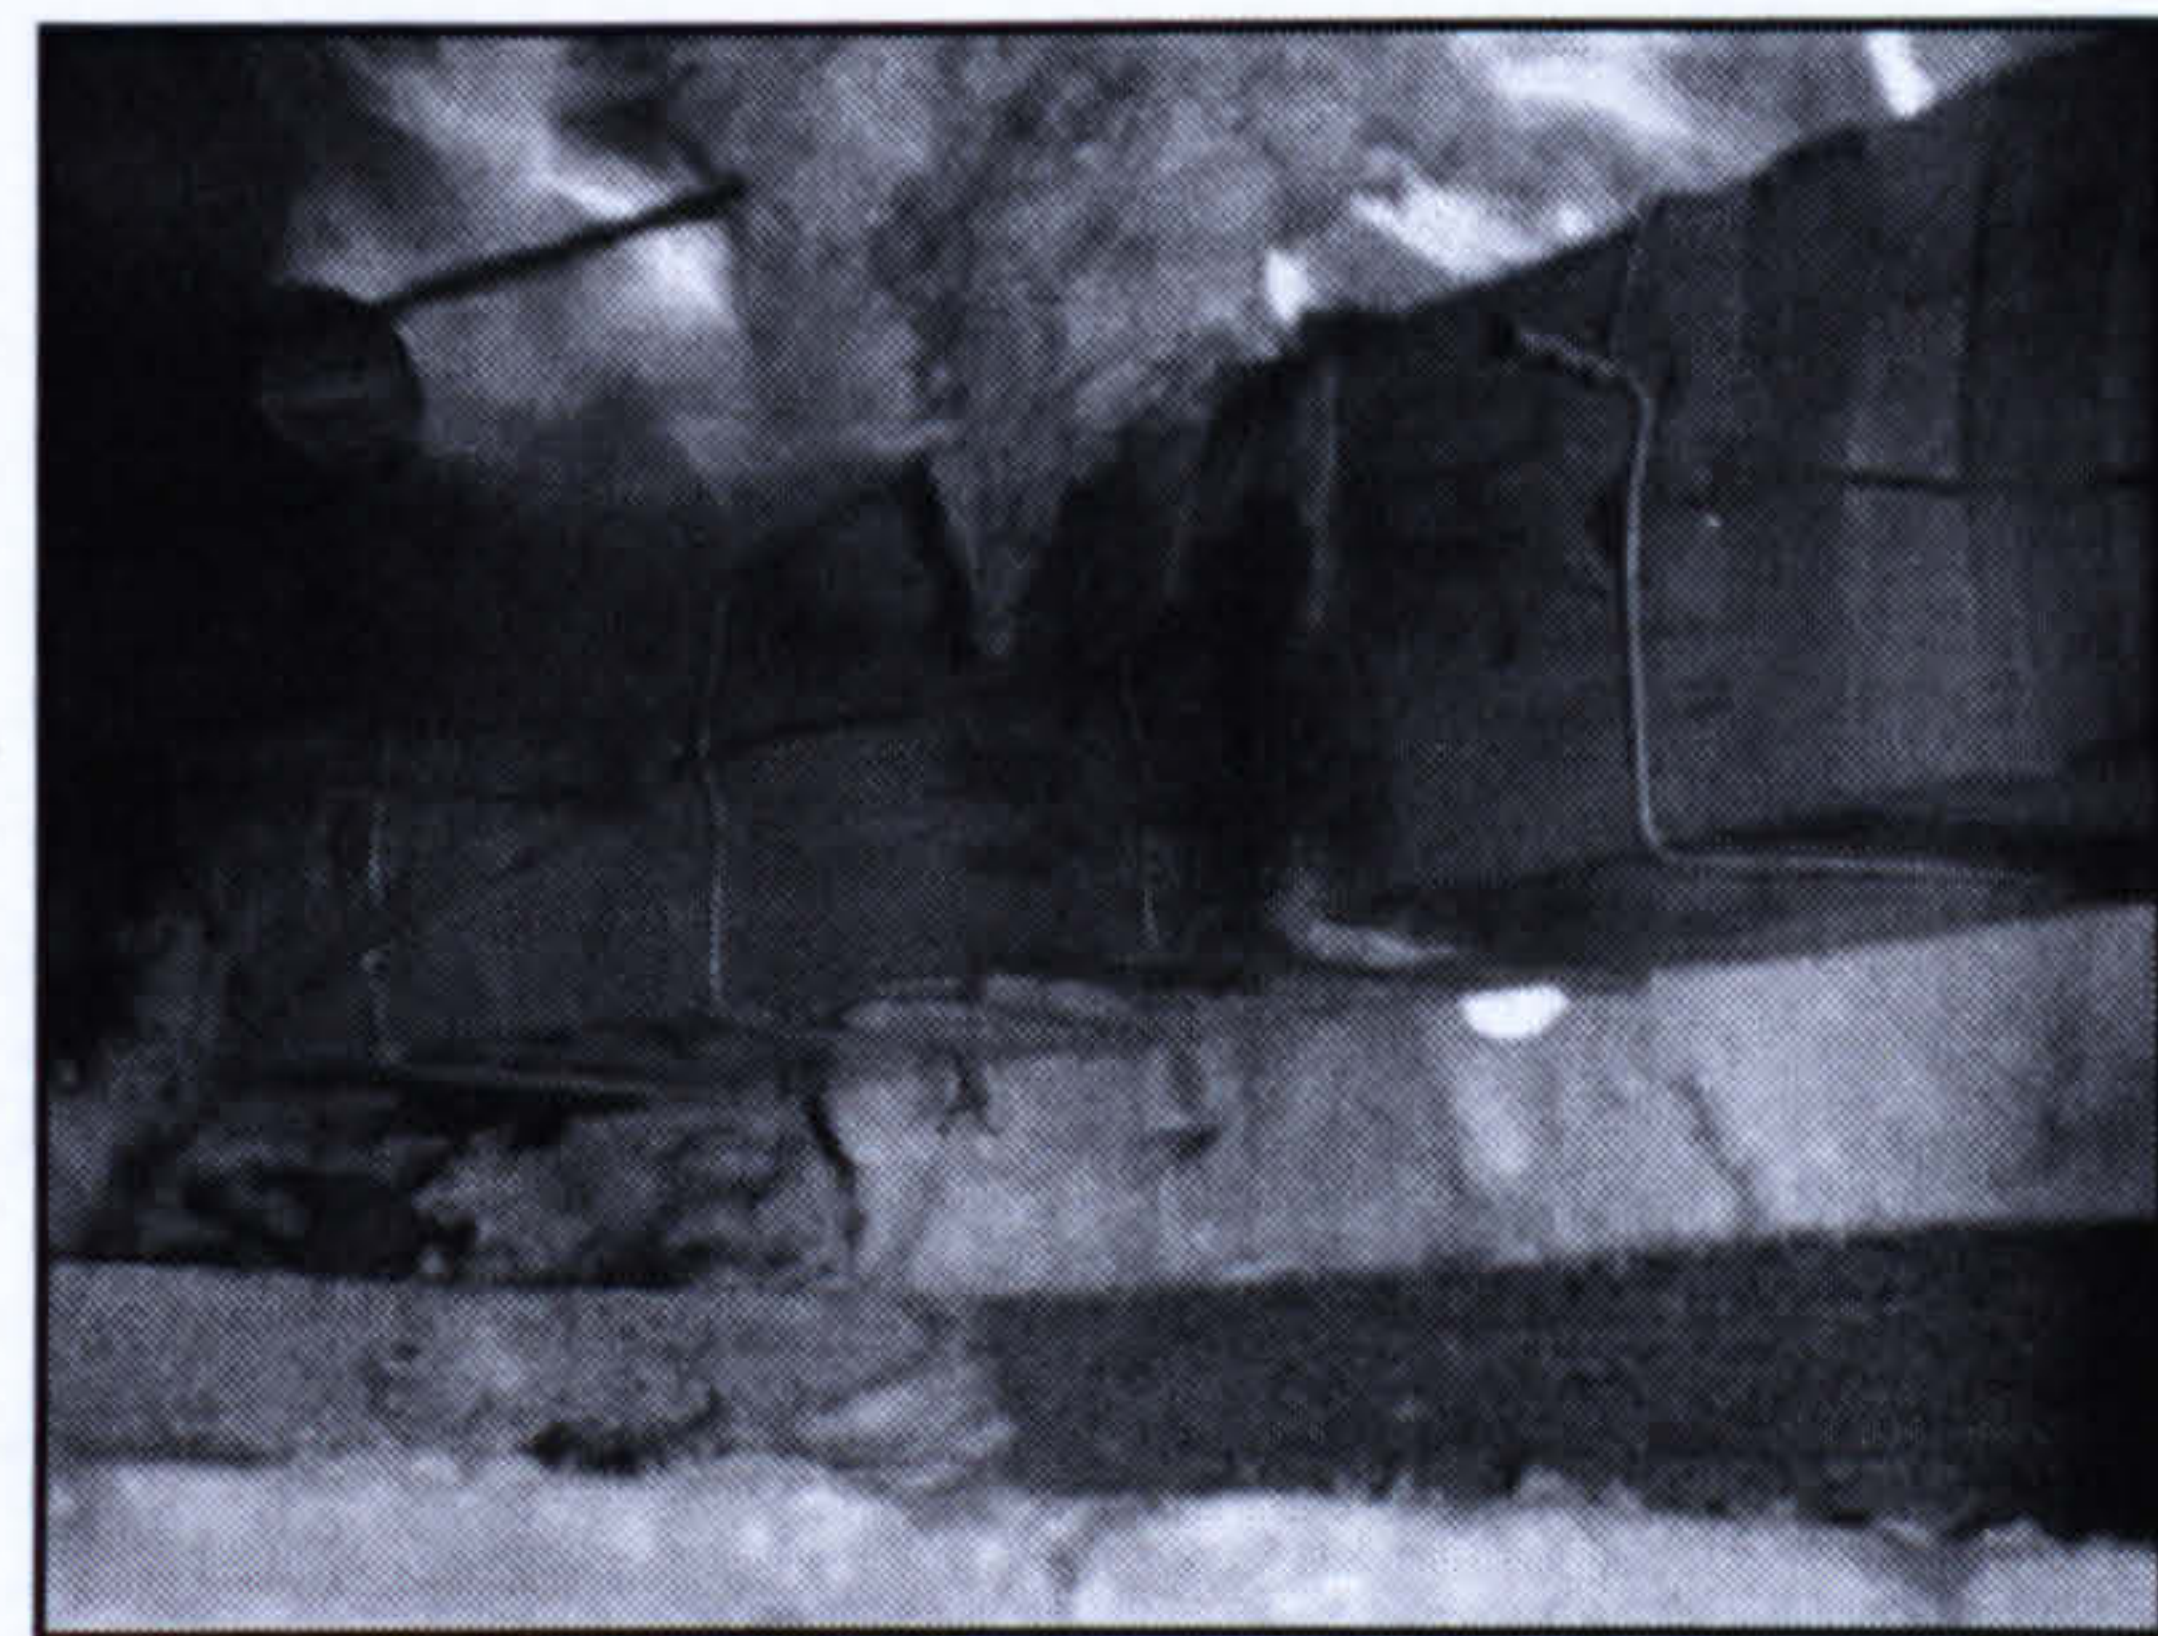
SOLAS furnace bending rig. The pultruded section is loaded by applying a torque to the threaded connecting rod.
